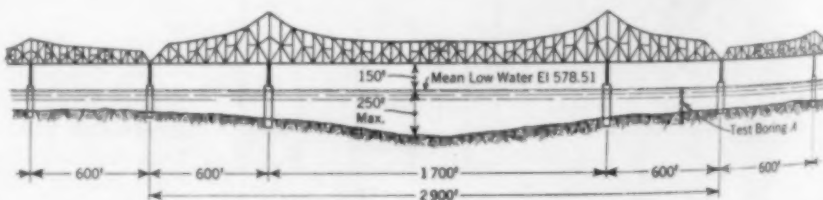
ELEVATION OF MAIN SPAN OF PROPOSED DIRECT BRIDGE CROSSING
